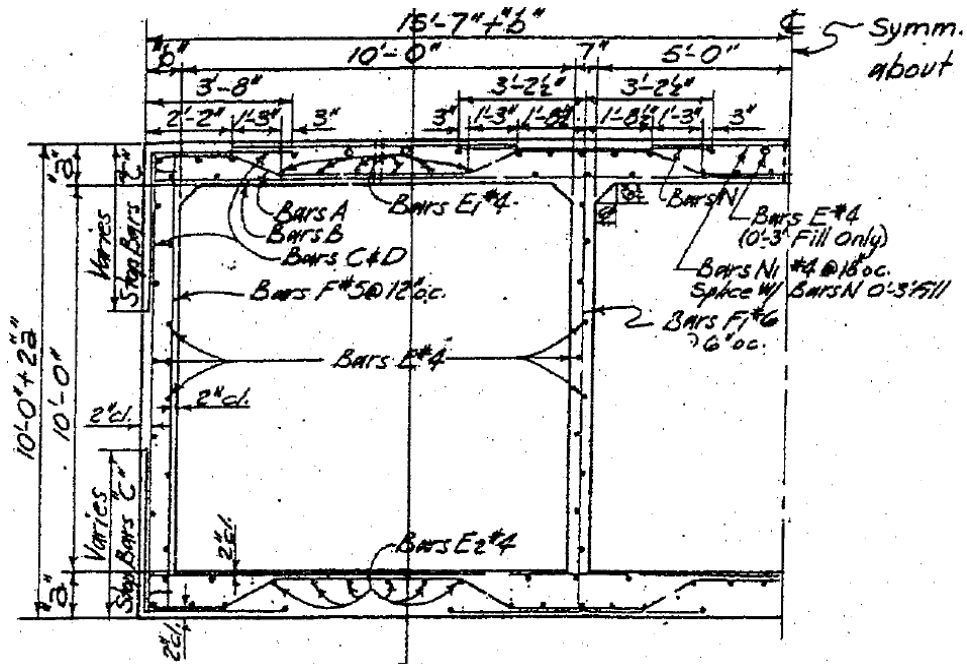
Dadeville Culvert at 45+31.55 Half-Typical Cross Section (ALDOT 1983)
